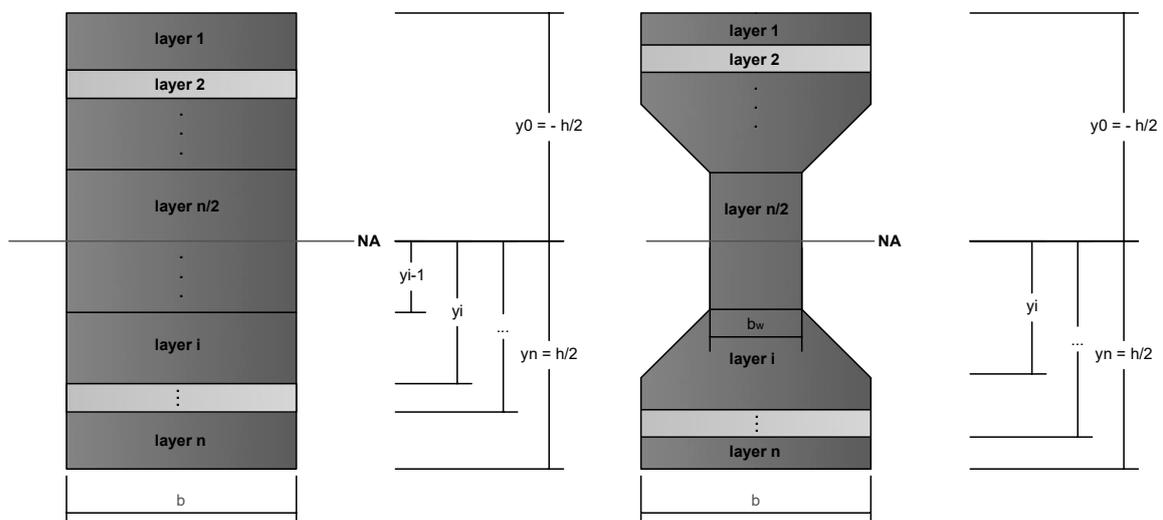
Rectangular and I-shape beam's cross section divided into  $n$  layers
